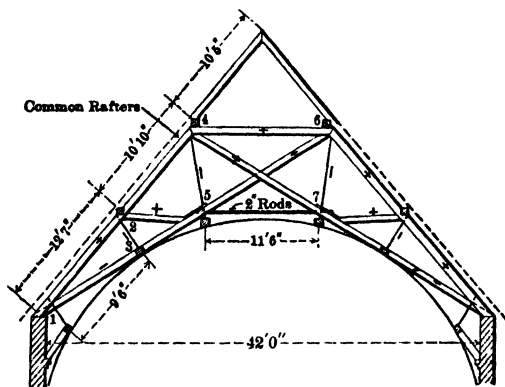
Modified Scissors Truss. Spans Exceeding Thirty-six Feet
